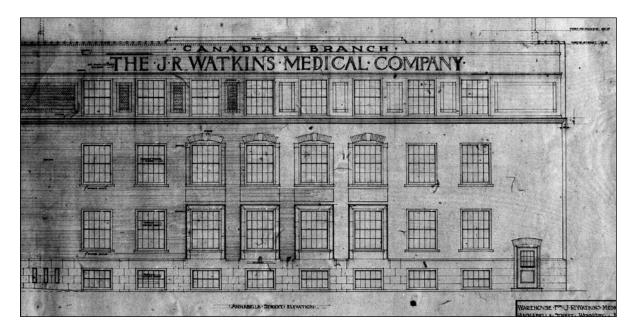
"Annabella Street Elevation," Architect's Plans No. 2346/1914. (City of Winnipeg.)
